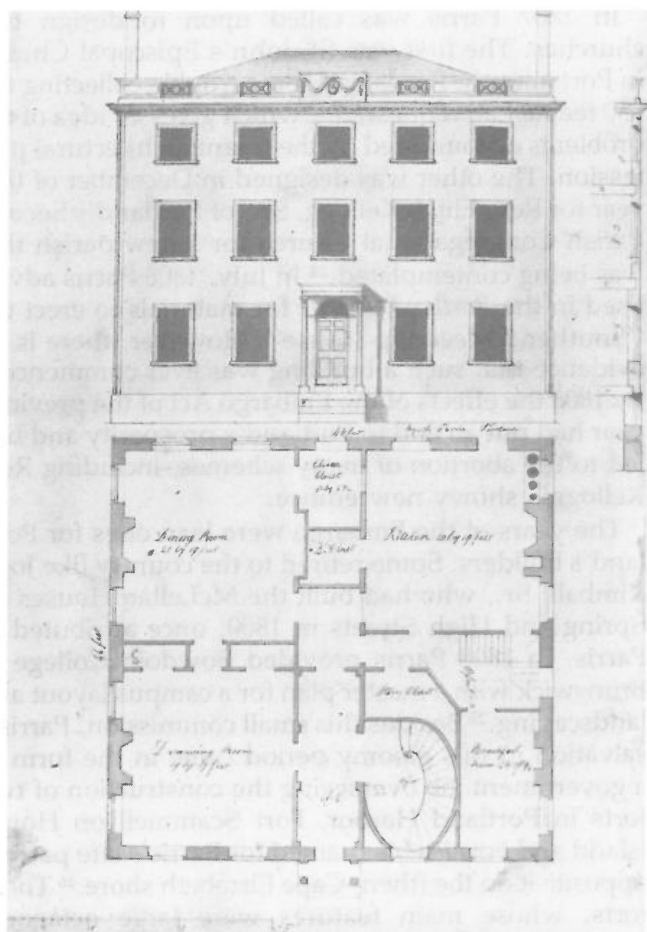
Elevation and floor plan of the Richard Hunnewell House, Portland, by Alexander Parris, 1805 (Courtesy of Boston Athenaeum).
